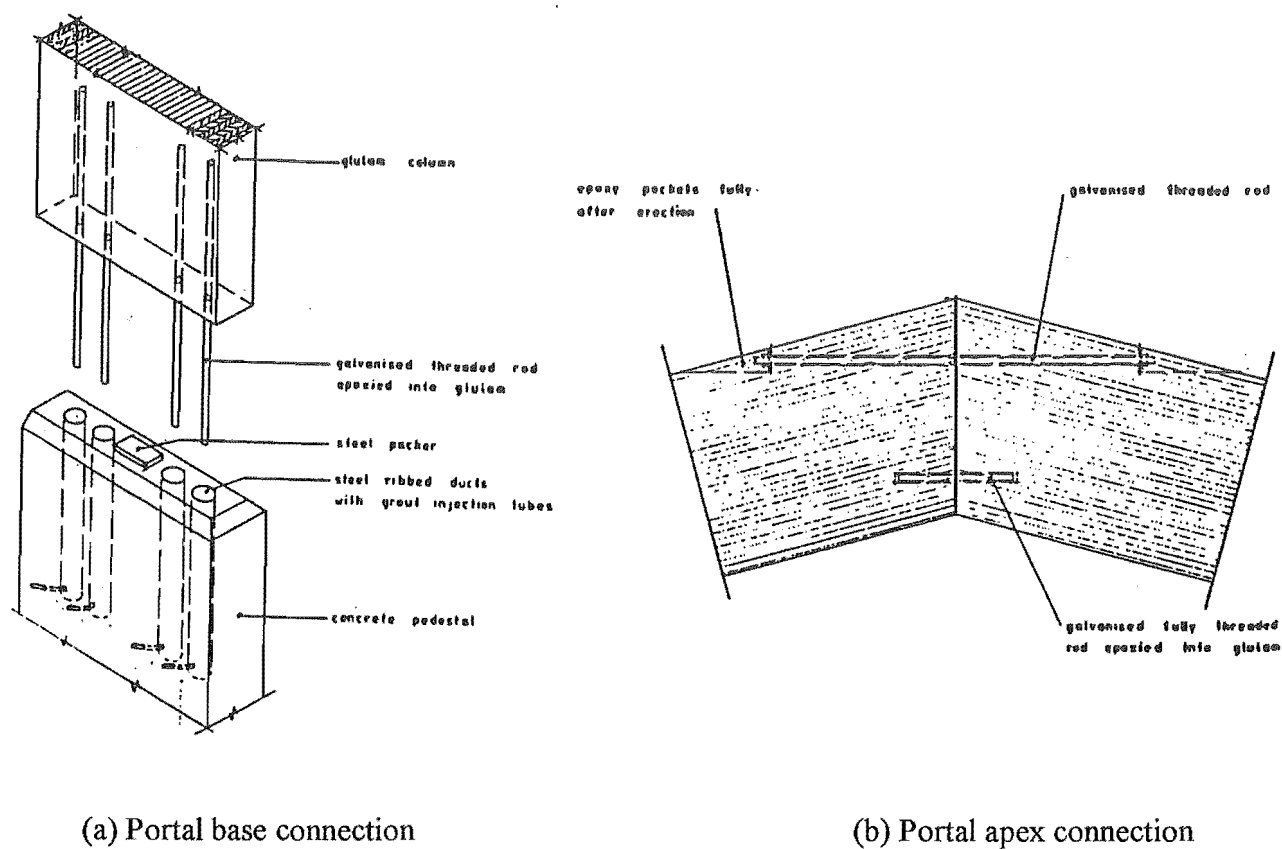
Applications of the epoxy bonded steel connections (Buchanan and Fletcher, 1989)
